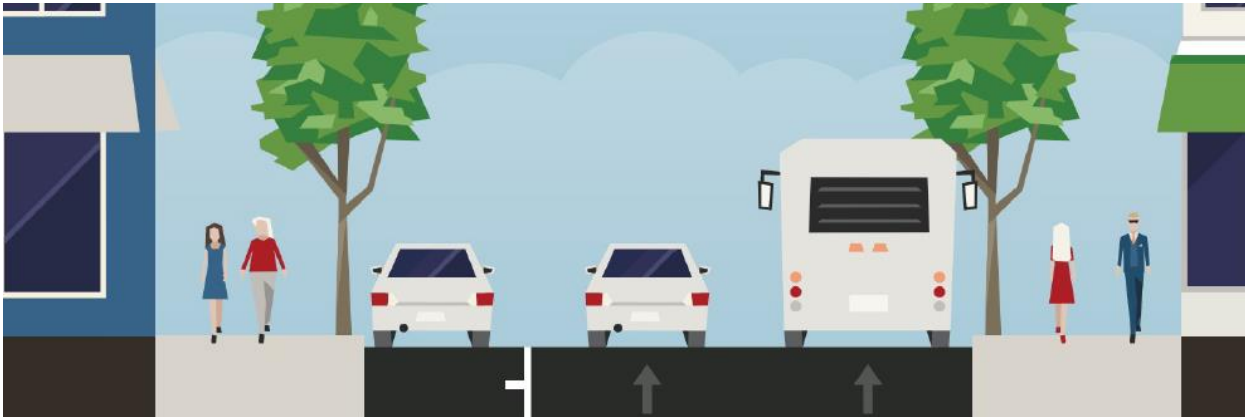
Proposed cross-section: Sacramento between Leidesdorff and Front streets
